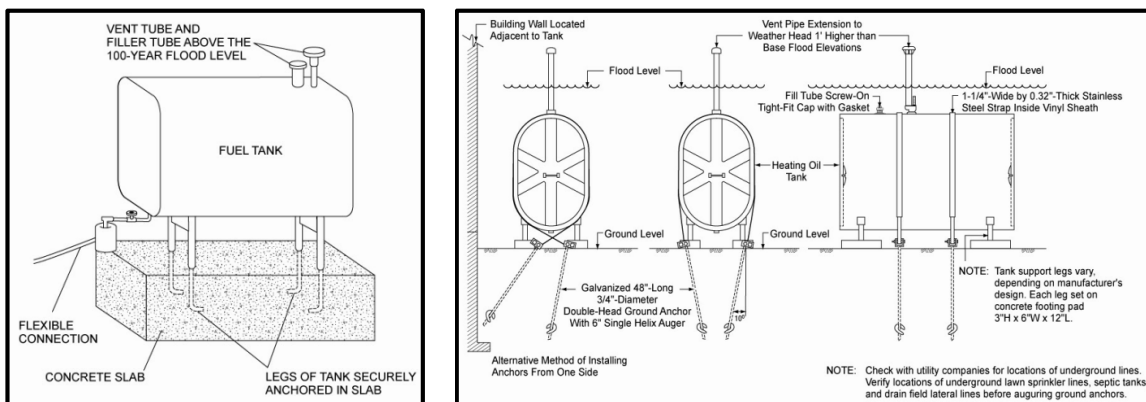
Anchoring Fuel Tanks (source: FEMA Anchor Fuel Tanks)
